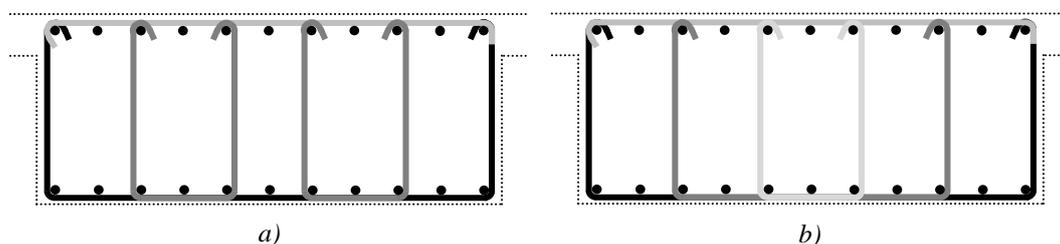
Alternate configurations of beam stirrups according to ACI-CRSI (2010).
